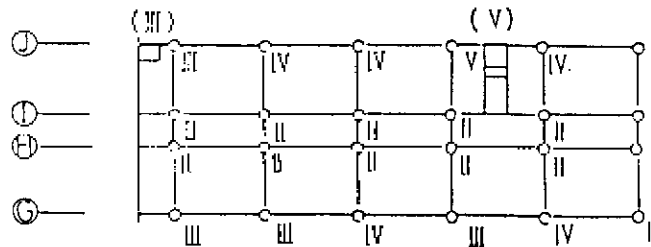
DAMAGE RANK OF COLUMNS AT THE THIRD FLOOR
